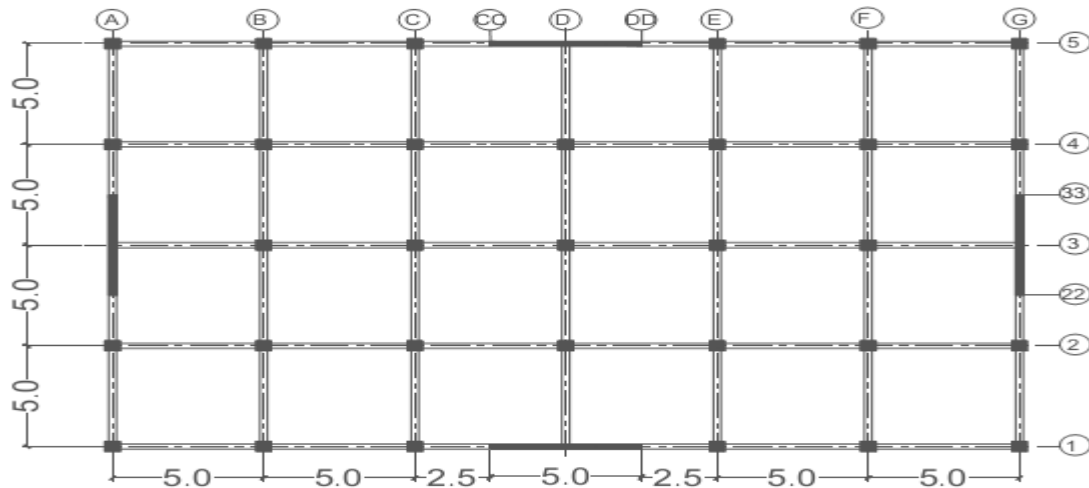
Typical structural layout of building Model 2 (G+10)
